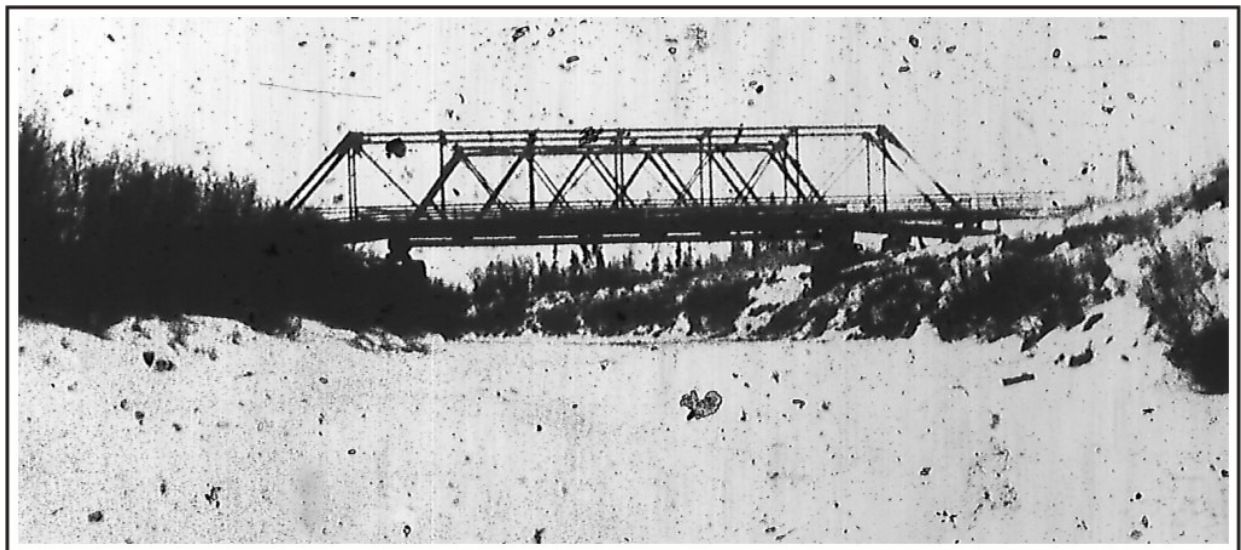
The Knik River Bridge, a steel camelback truss, August 19, 1936. U.S. Alaska Road Commission Collection, PCA 61-1-242, Alaska State Library.
